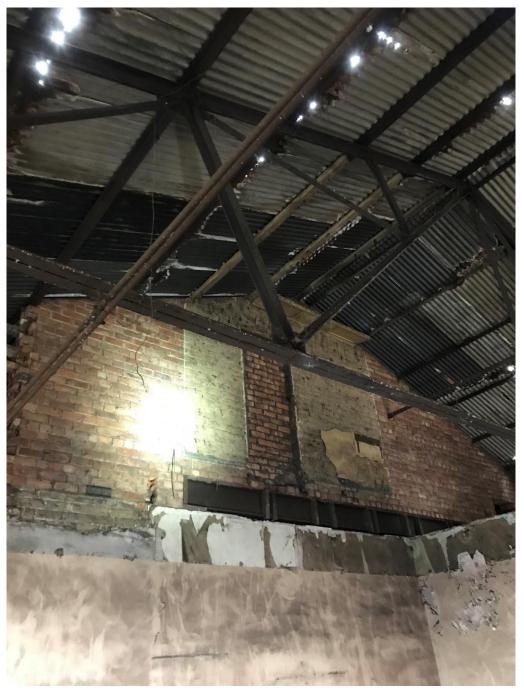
Interior of welfare block of structure B1b, note poor condition of corrugated metal roof
